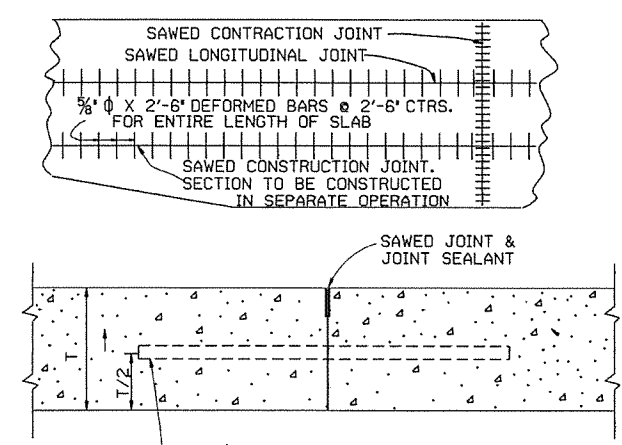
DETAIL OF SAWED LONGITUDINAL JOINT AND LONGITUDINAL CONSTRUCTION JOINT
